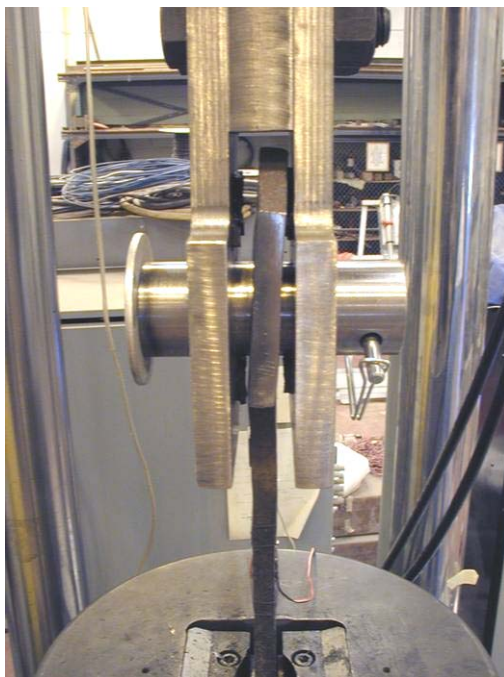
Eyebar End Connection B After Being Placed in MTS Testing Machine
